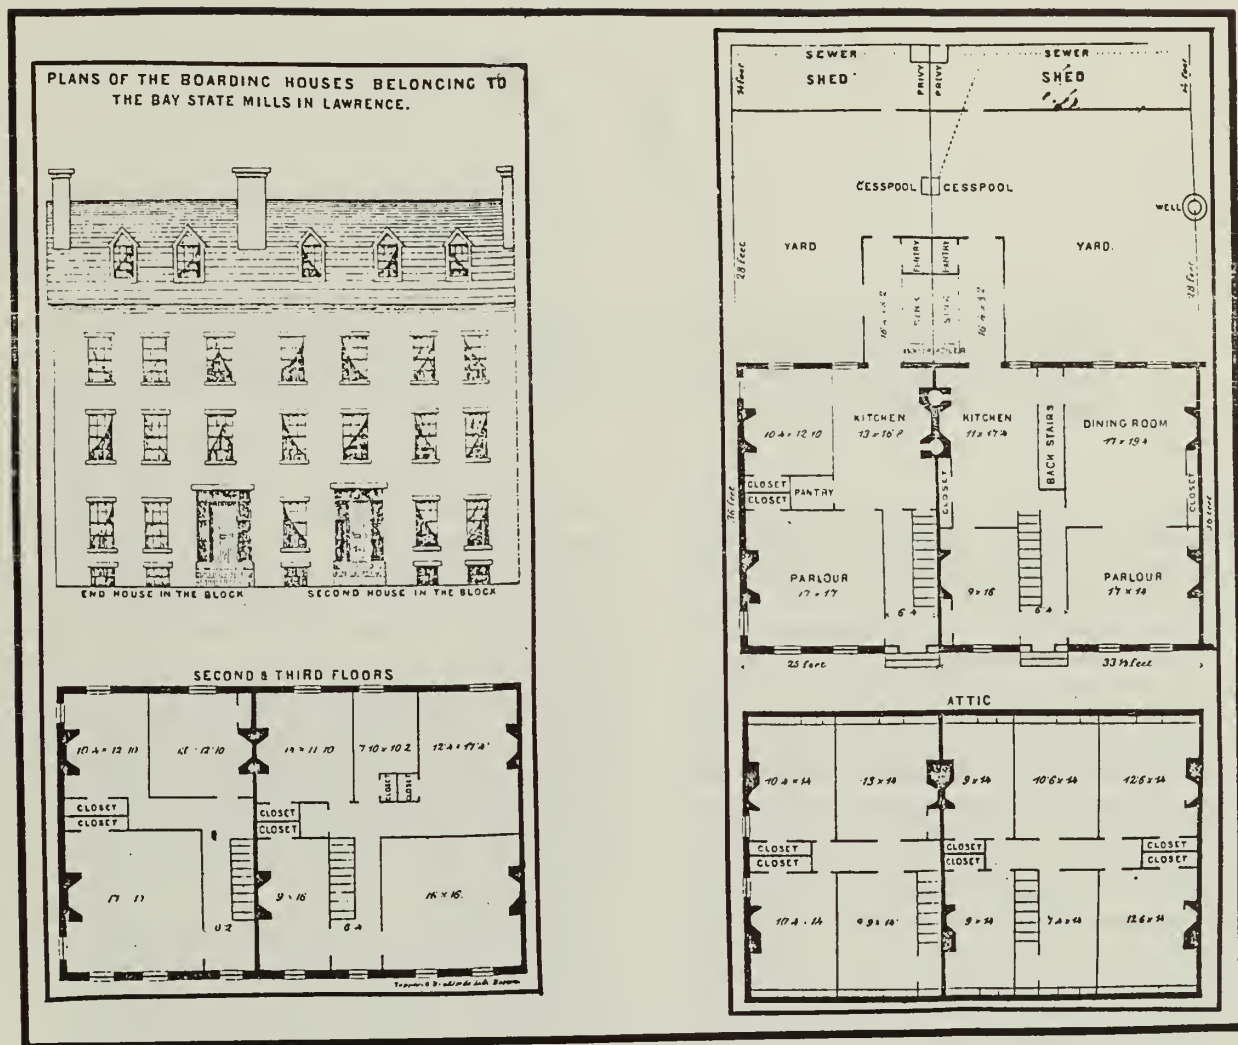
Elevation and plans of Bay State Mills boardinghouse, Lawrence, Massachusetts. (Reproduced from Shattuck 1850.)
